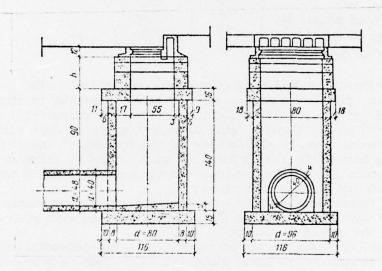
Pre-fab, reinforced concrete, storm-drain application
